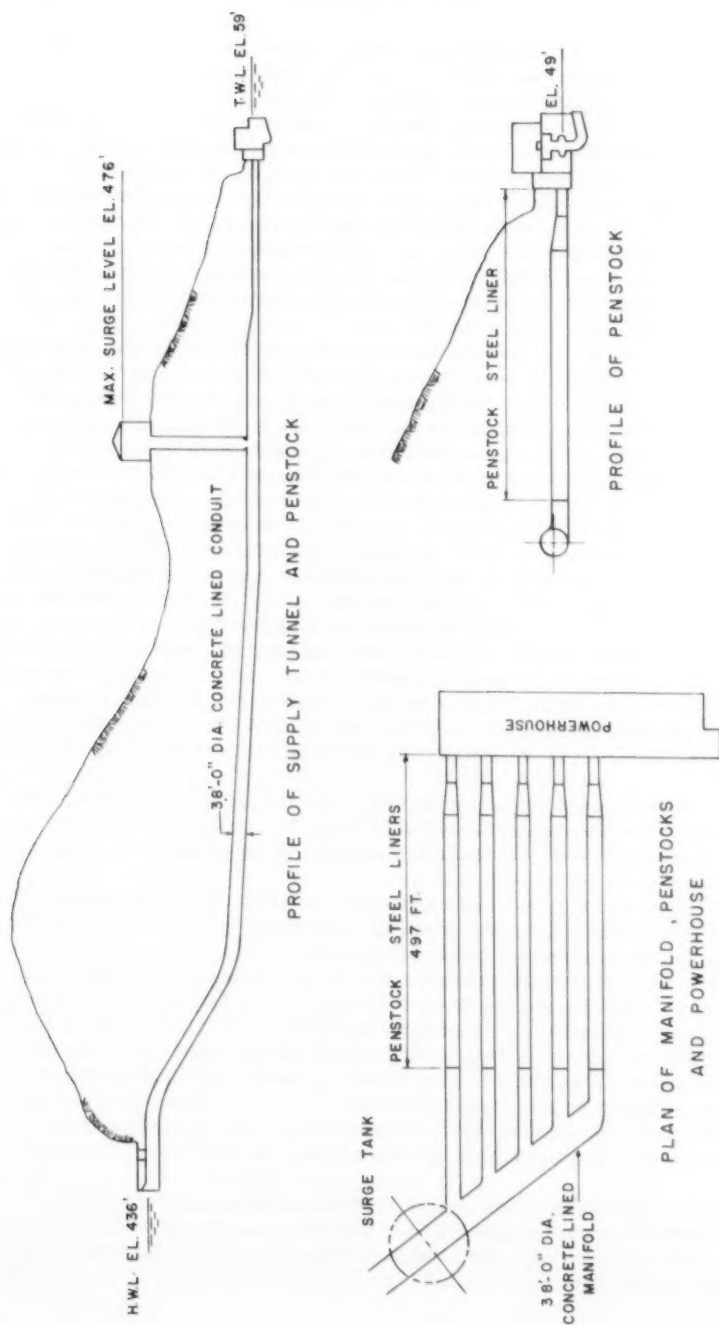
PLAN AND PROFILES OF BERSIMIS NO. 2 DEVELOPMENT
